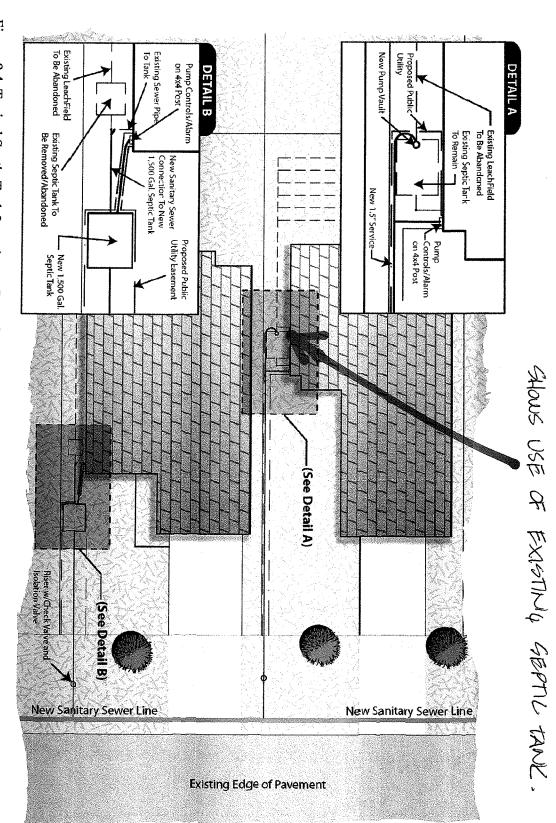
Typical Septic Tank Locations - Retrofit & New
